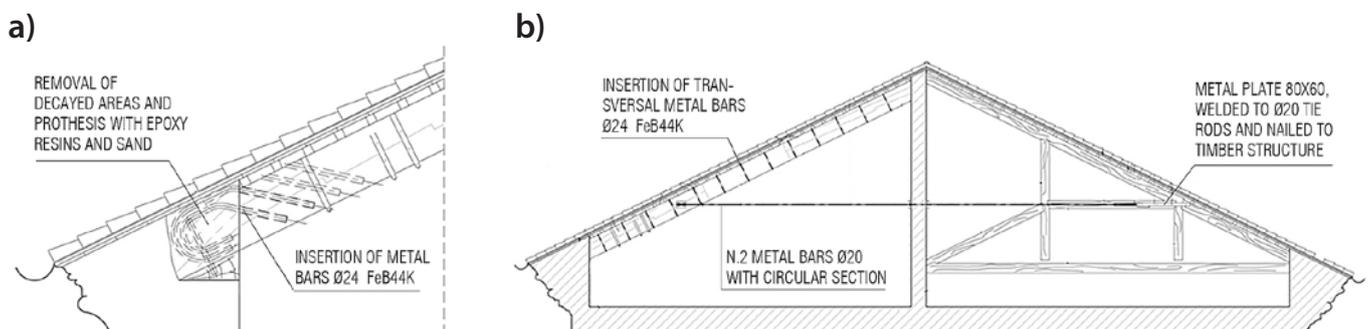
Strengthening of the E-S timber roof carried out in 1999: (a) replacement of decayed extremities with epoxy resins prosthesis reinforced with metal bars; (b) insertion of metal bars along "trave composta" and connection between rafters and central wall with metal tie-rods. (Image source: SBAP-FE-ADOC – Mezzadringegneria – FE-ADOC, Tav. 42, Pos. 2955).
